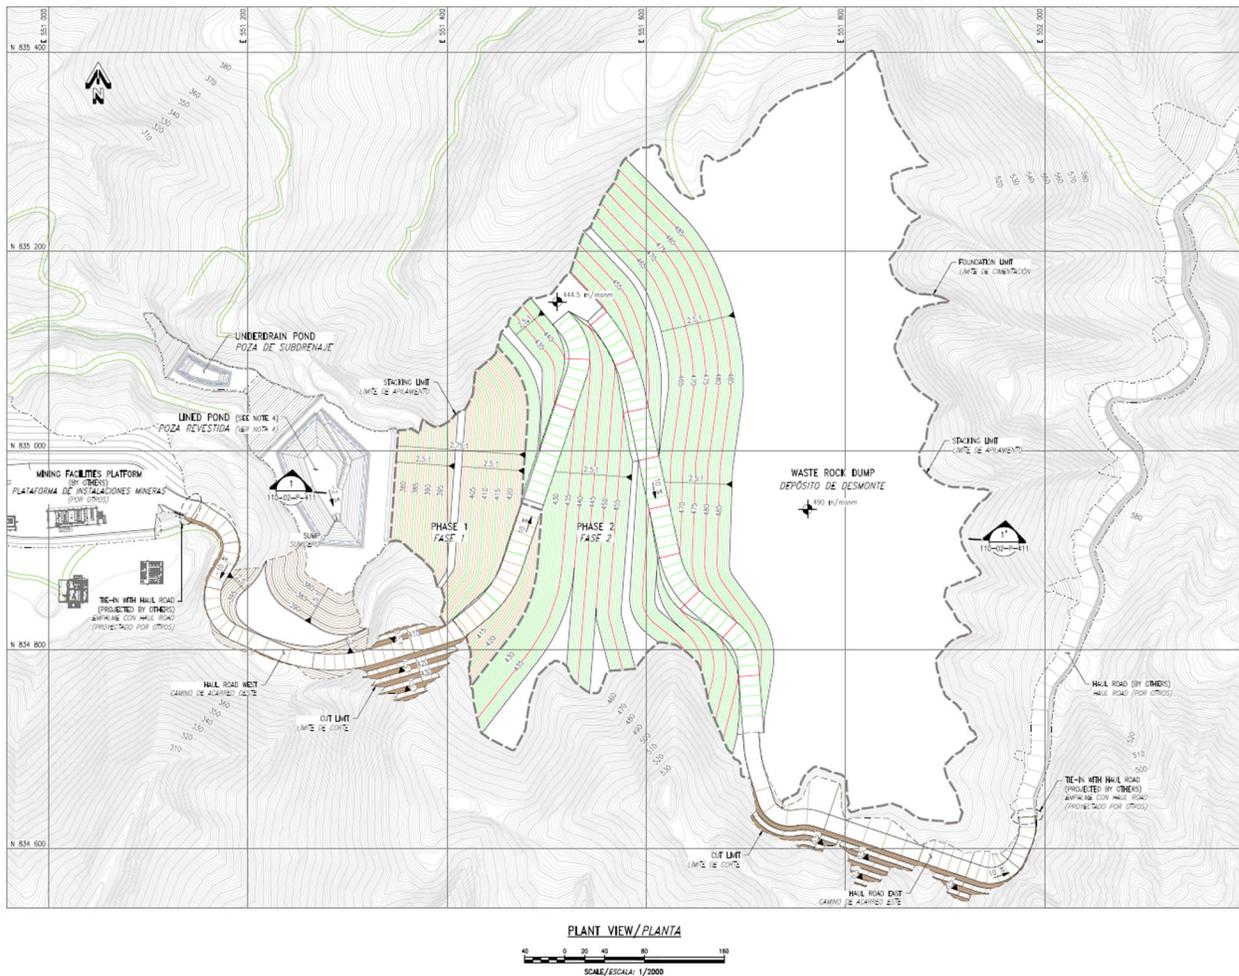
Upper Chontal WRD - Plan View (AA, 2021)
